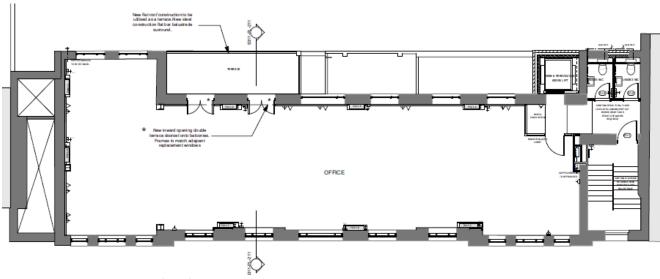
Proposed first floor plan showing proposed terrace. Terrace to be level with rear wing.
